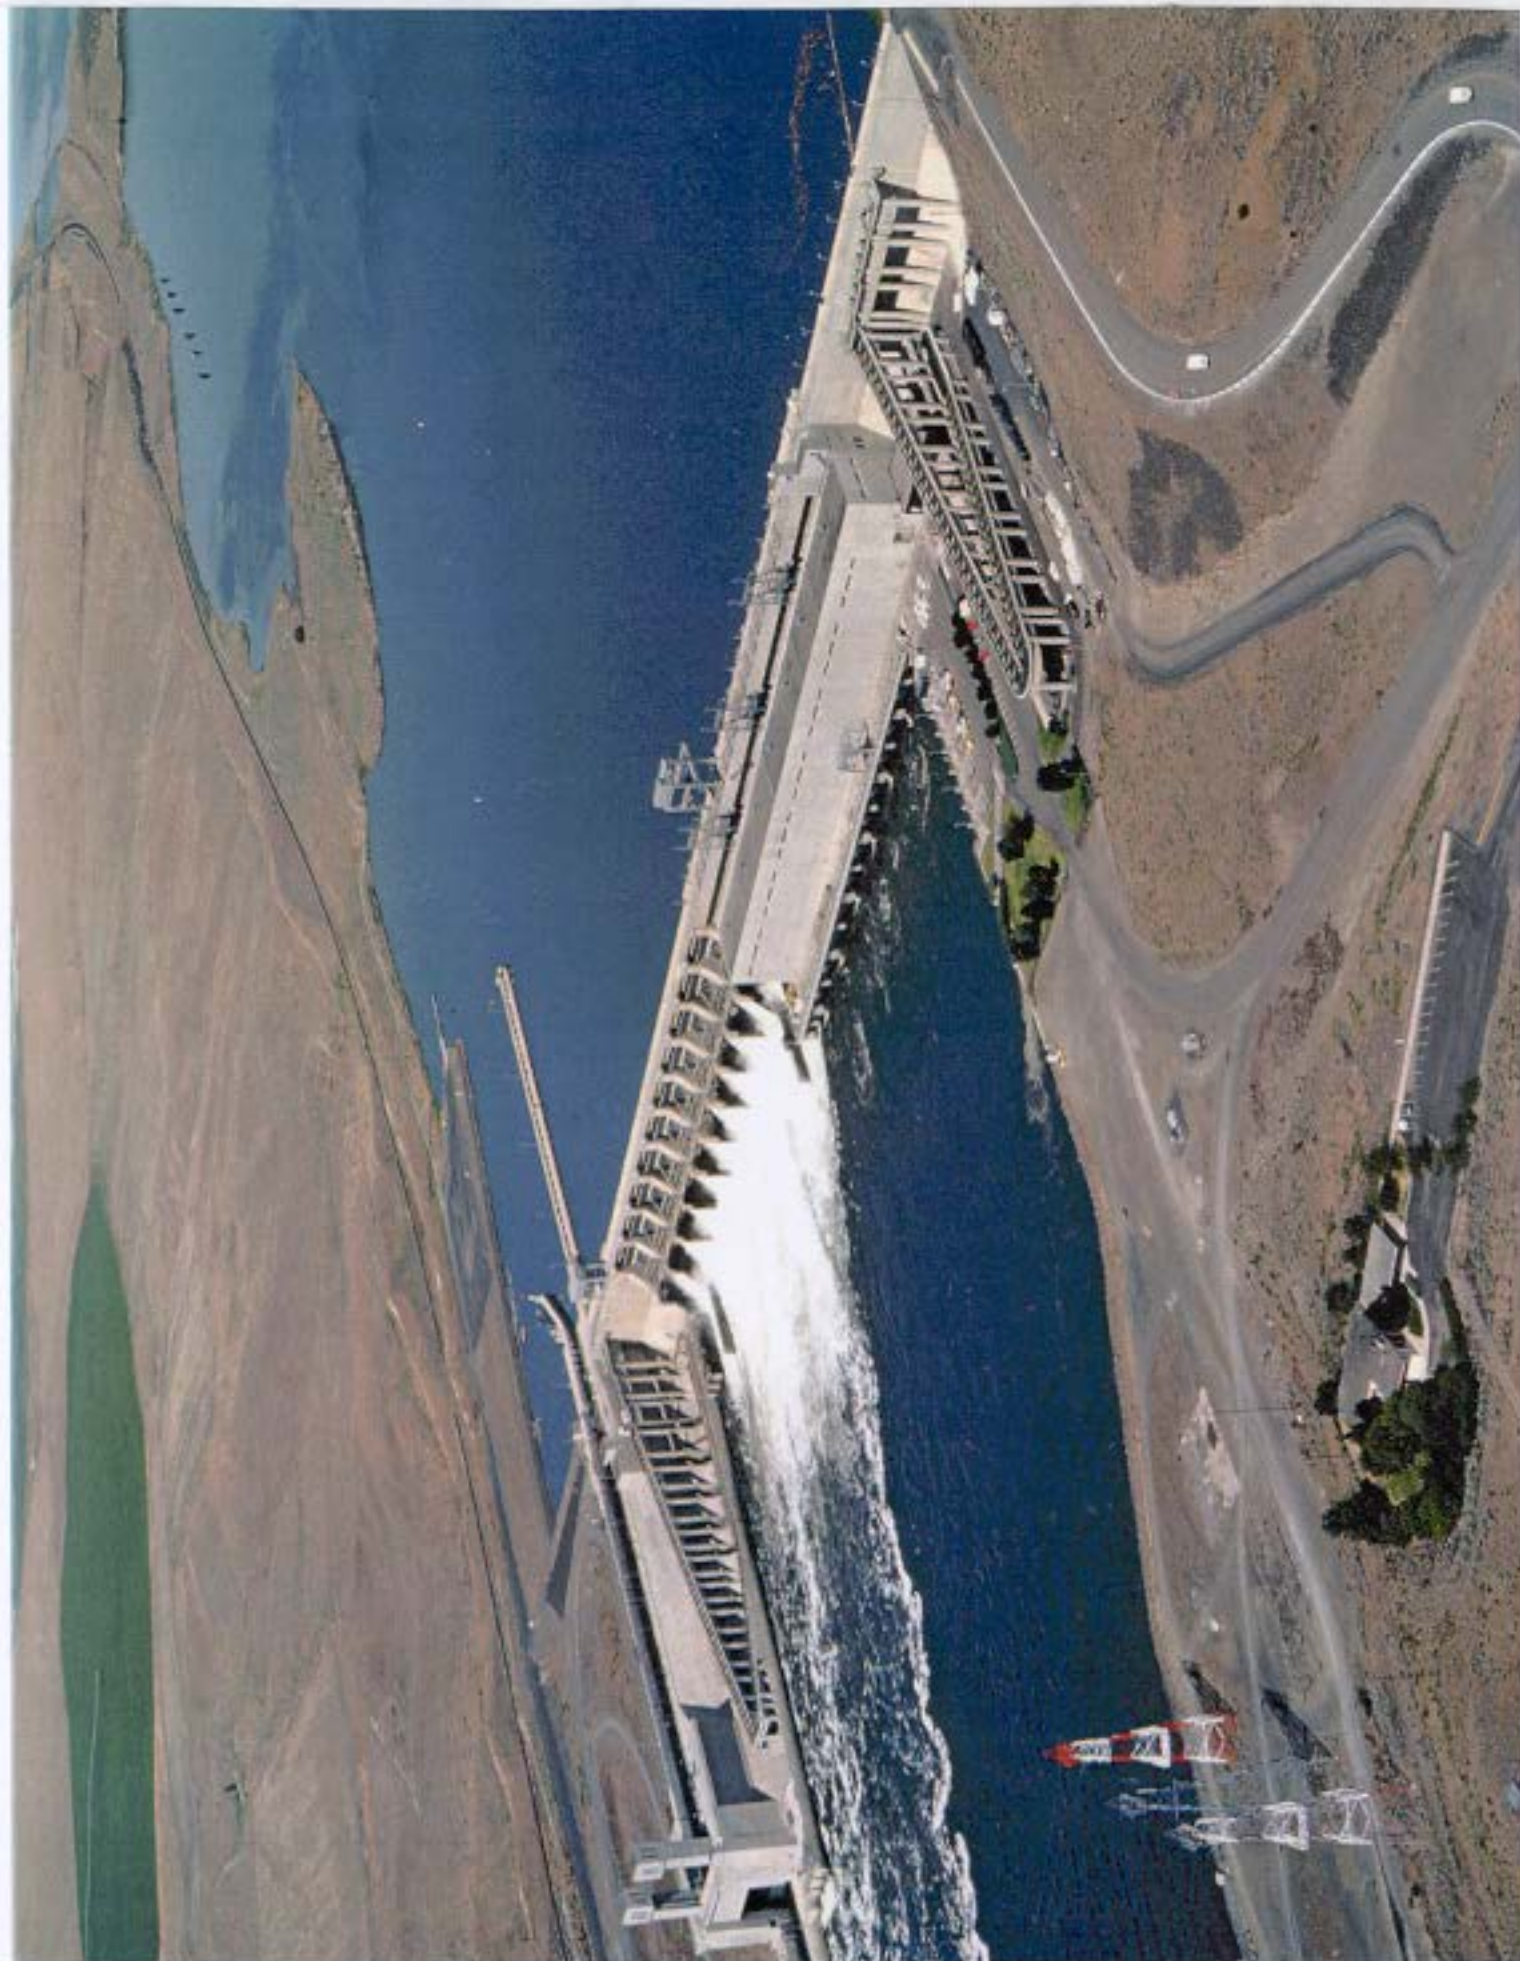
Lower Monumental – Existing Project Arrangement General Plan
